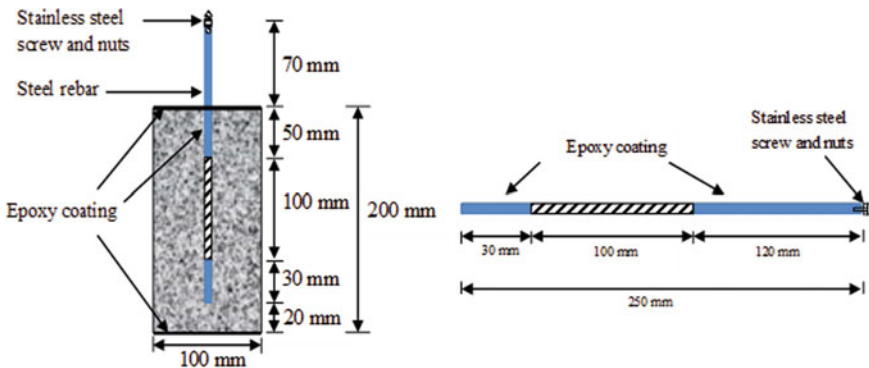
Schematic diagram of reinforcement steel bar and cylindrical reinforced concrete specimens
